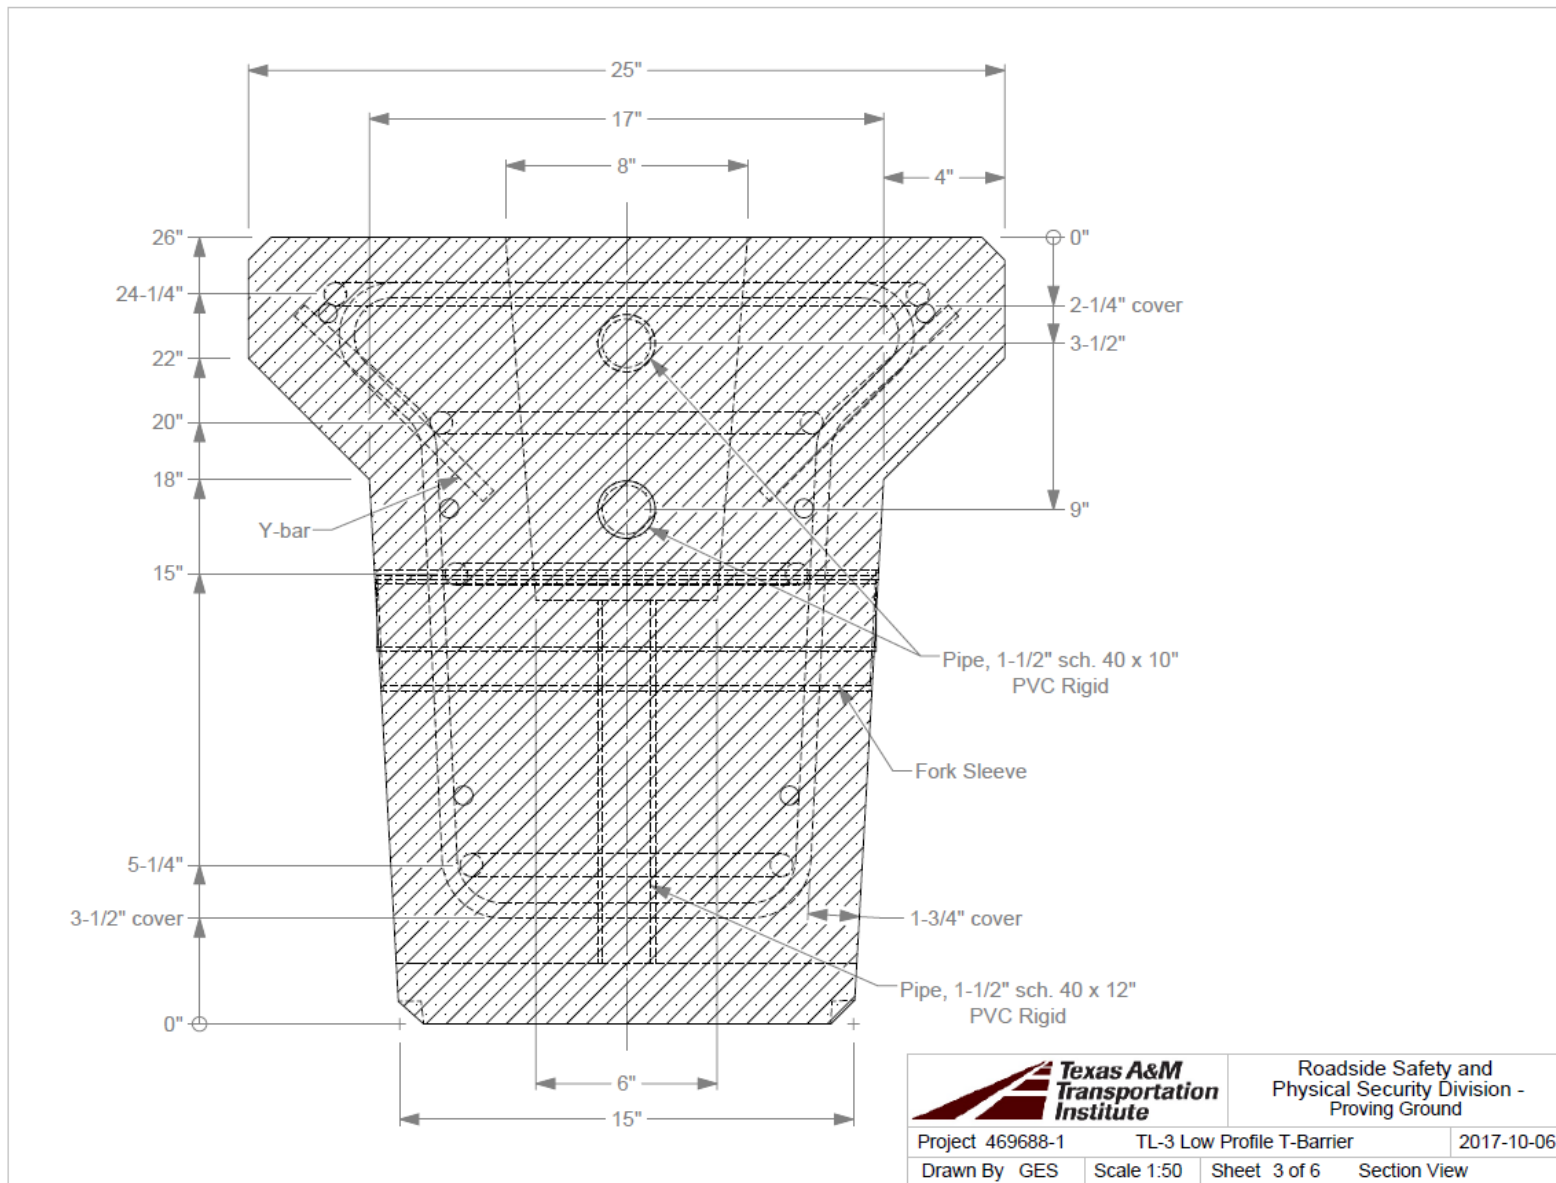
Detailed Geometry of the 26-Inch Tall T Shaped PCB
